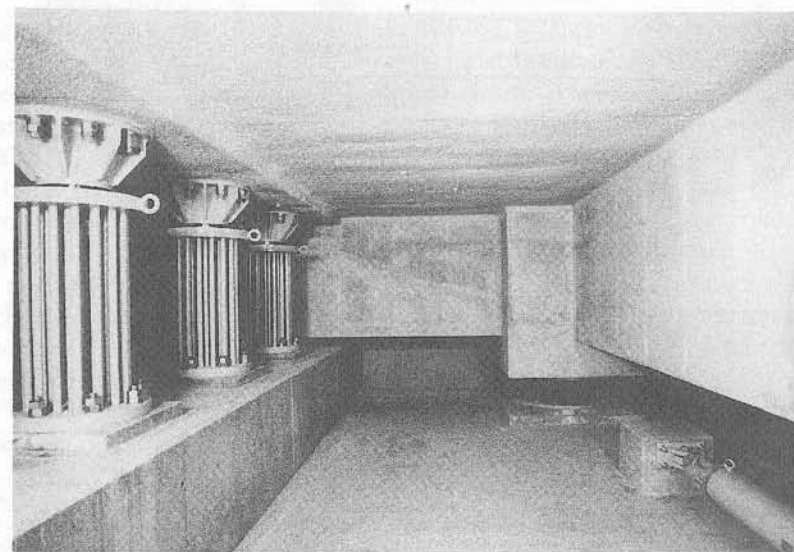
High-damping rubber bearing, steel dampers and oil damper in basement of Bridgestone Toranomon Building, Tokyo (photograph courtesy Shimizu Corporation)
